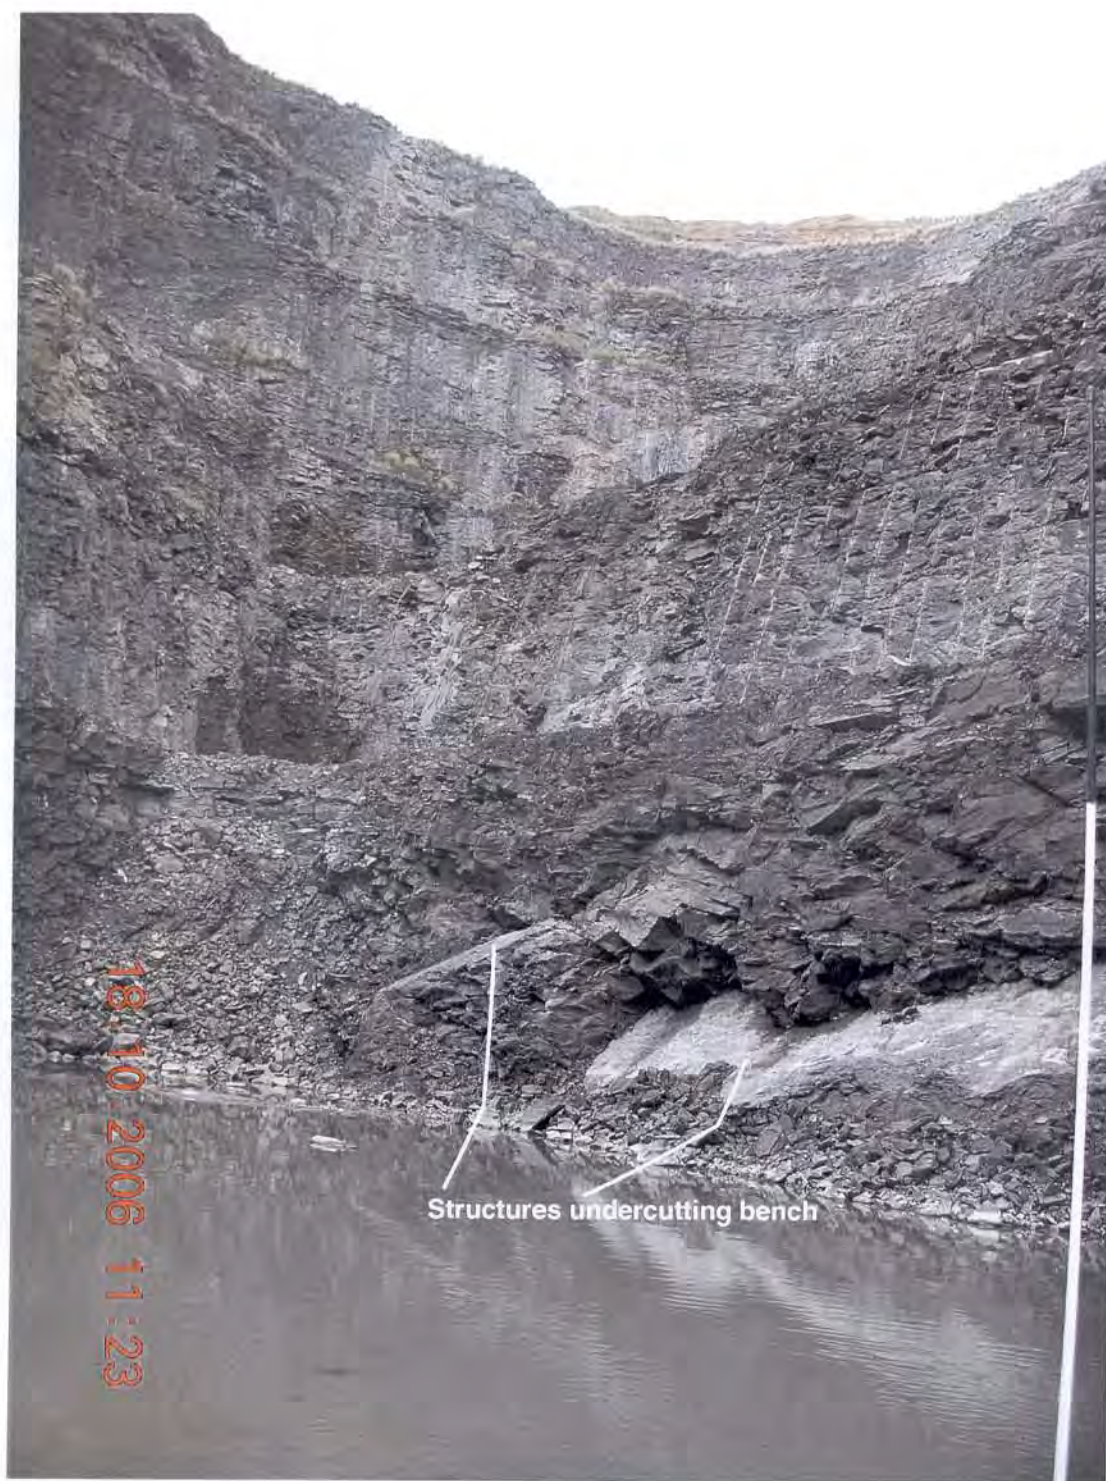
Lower east wall, highlighting structures undercutting lowest most bench. Area needs to be cordoned off to limit access.
